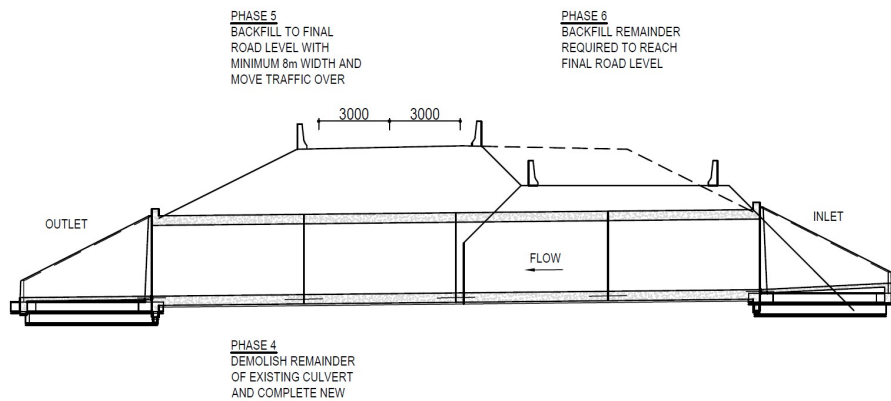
Construction Stage 2: Dual traffic is moved over to the newly constructed right hand side. Remainder of the culvert is constructed with road layers to final road level on the left. Construction Stage 3: Traffic is moved onto the left hand side and the road layers on the right hand side are then constructed to final road level.
